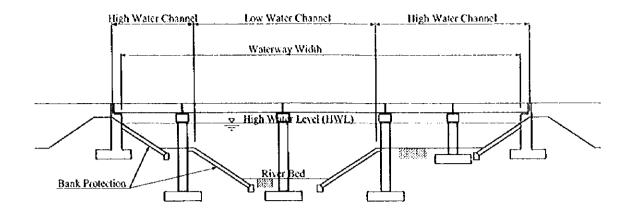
General River (Compound) Cross-section and Bridge Layout
